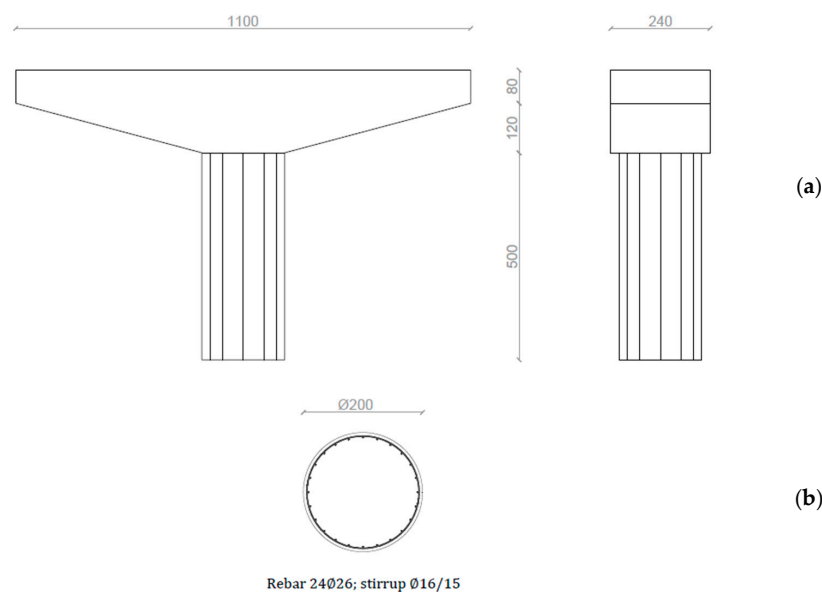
Circular cross-section pier: (a) elevation view; (b) cross-section with details of the reinforcement. Dimensions in cm.
